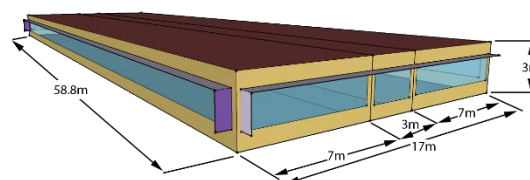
Non-residential Building with all Zones <7 m of the Building Perimeter.
